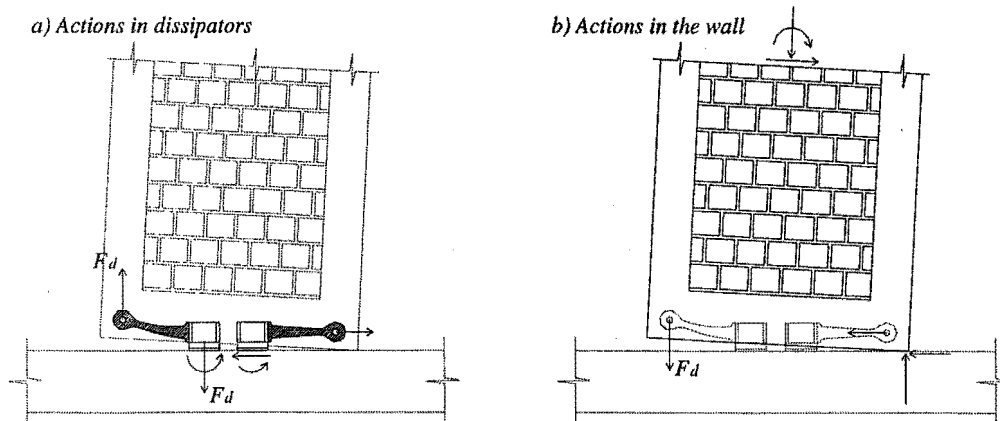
Actions in flexural dissipators and wall when the rocking wall uplifts
